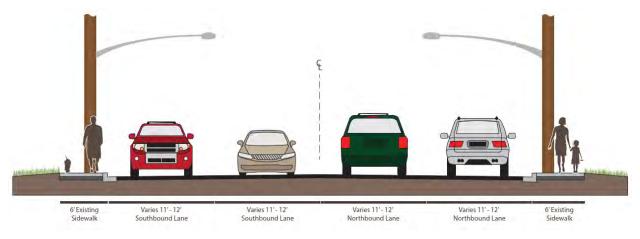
Existing Typical Section – Segment 2 (north of Warren Avenue Bridge)
